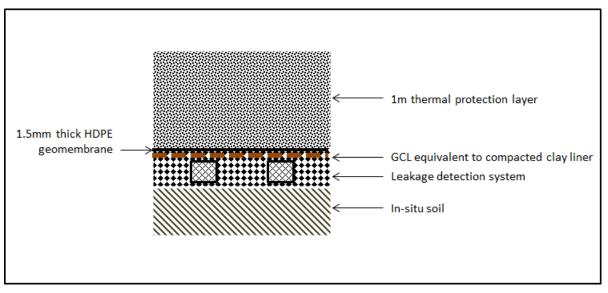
AN ILLUSTRATION OF THE CLASS C BARRIER SYSTEM TO BE INSTALLED FOR THE SLAG DUMP (SLR, 2016)
